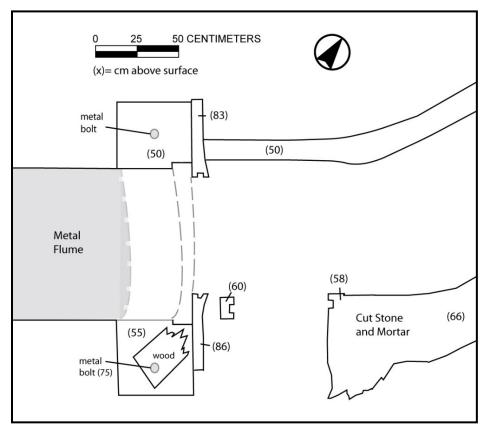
Plan view of Sluice Gate Location 1 (SIHP # -4664)
